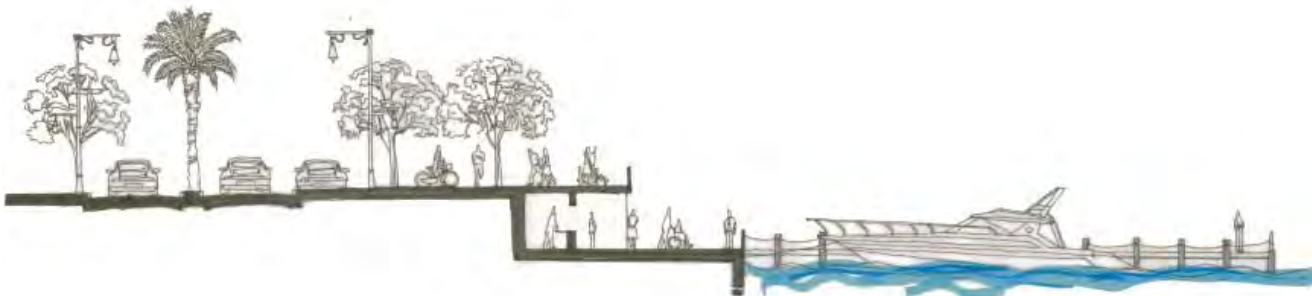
Proposed section D-D': Waterfront zone with a mixture of public and private terraces
